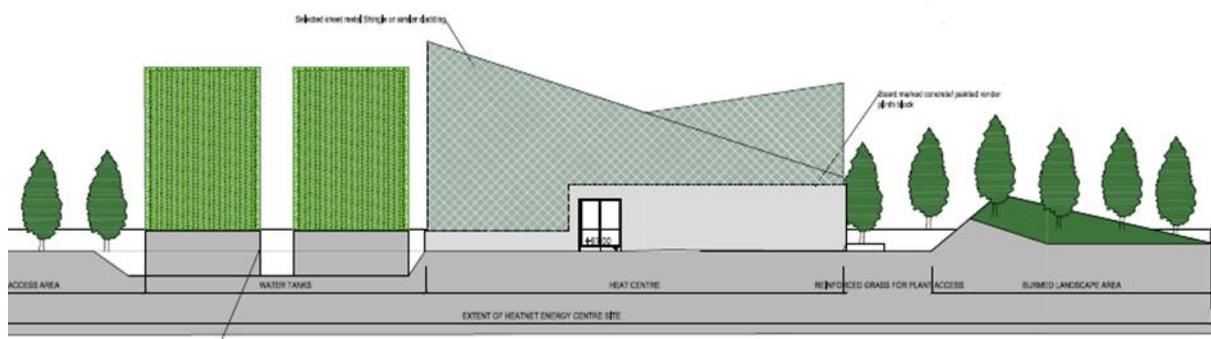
Proposed TDHS Energy Centre Elevation Drawing
